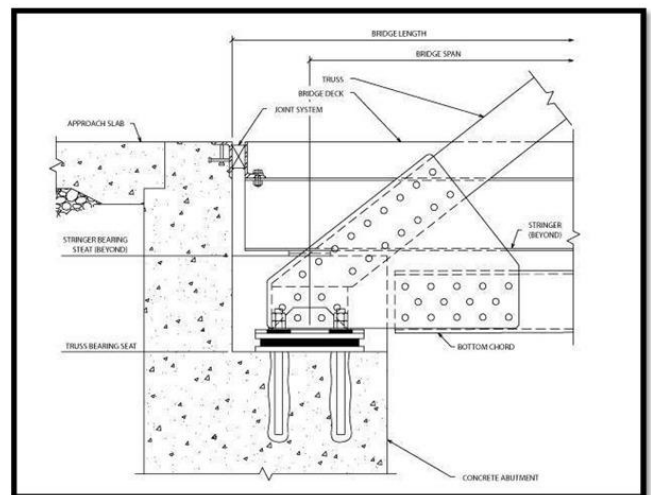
Simulation of Hydraulically operated steel Truss bridge
